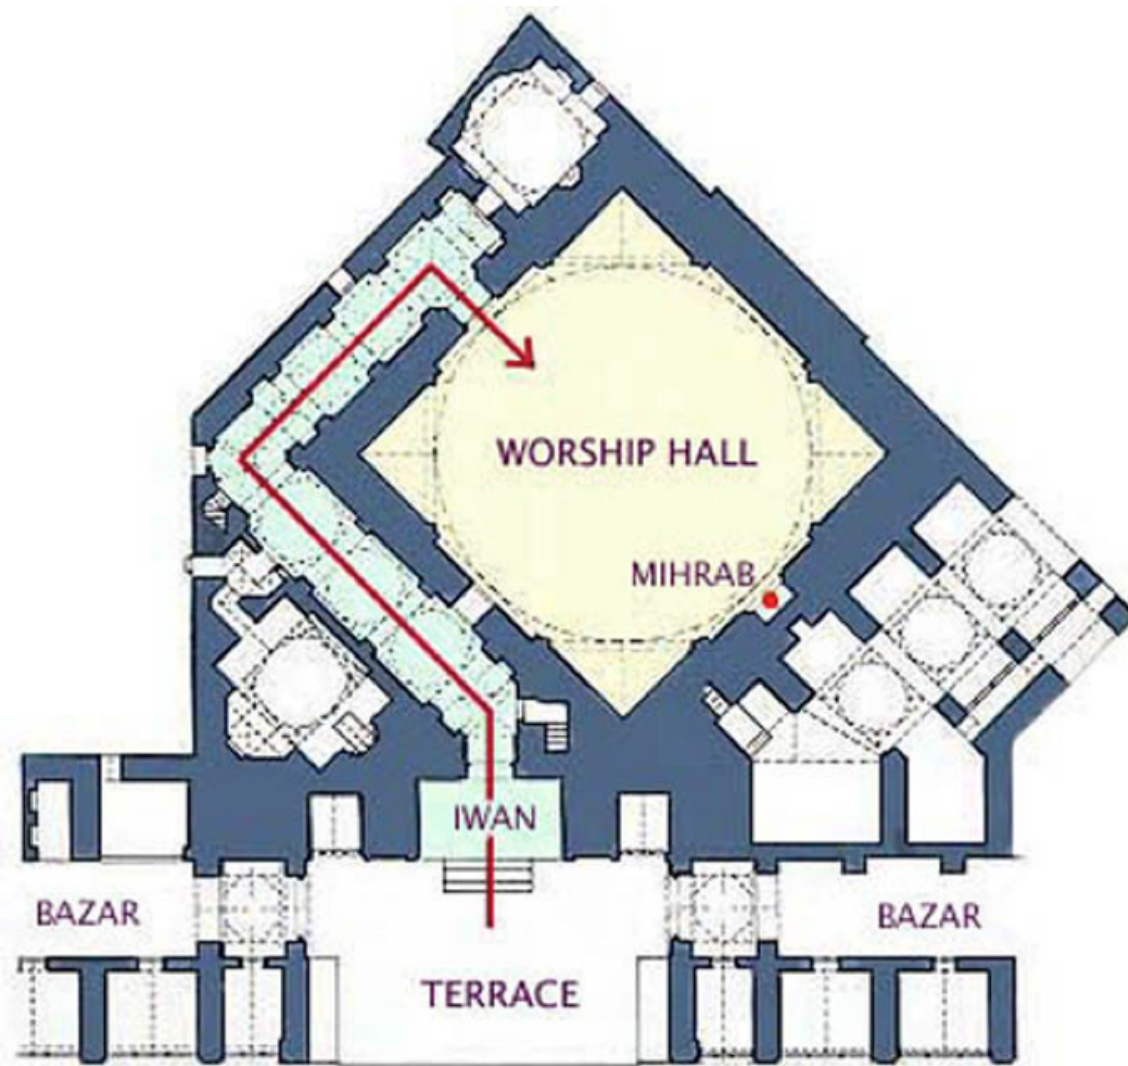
Sheikh Lutf Allah Mosque floor plan (young, 2013).
